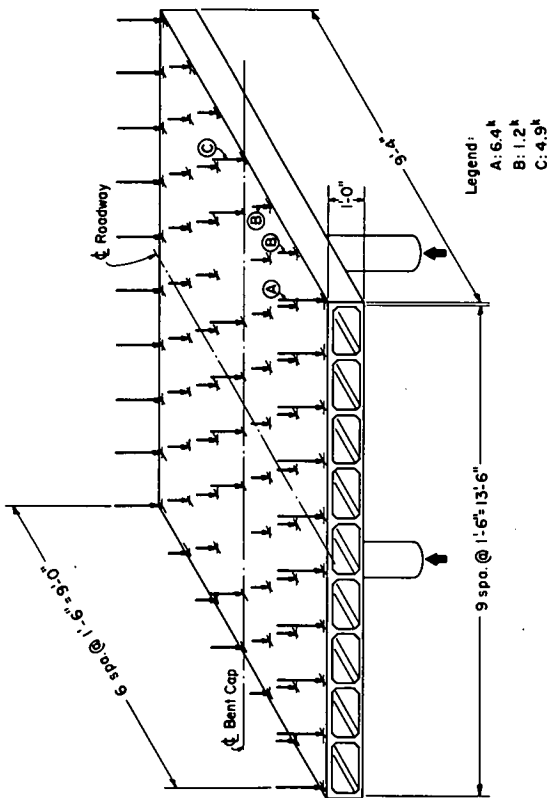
Design Ultimate Superimposed Load on Double-Column Bent Cap Specimen
